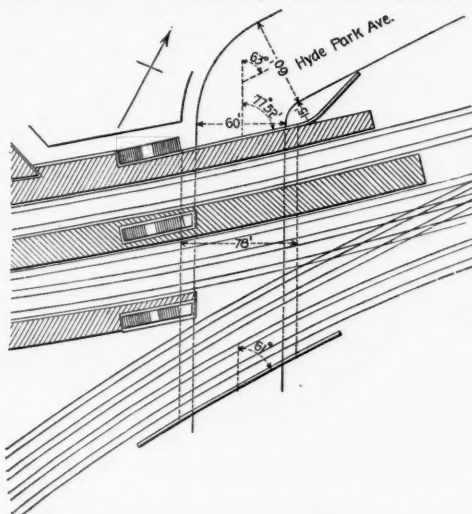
Hyde Park Avenue Bridge at Readville
